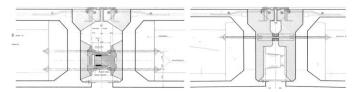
Longitudinal cross section of the Zeeland bridge sliding (left) and fixed (right) mid span joints.
